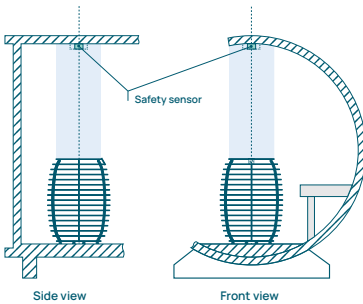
Installing the safety sensor on the ceiling in barrel saunas: floor-mounted heater
